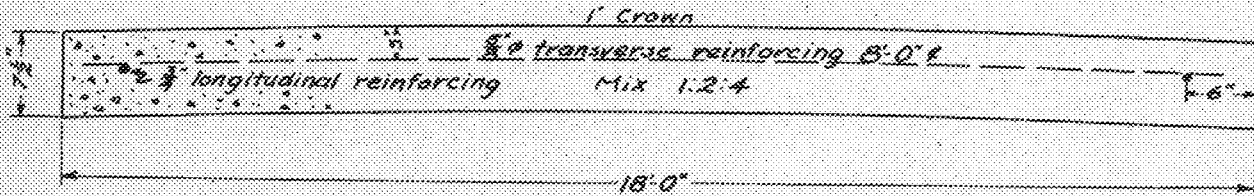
FIGURE A, CROSS SECTION ONE COURSE CONCRETE PAVEMENT
